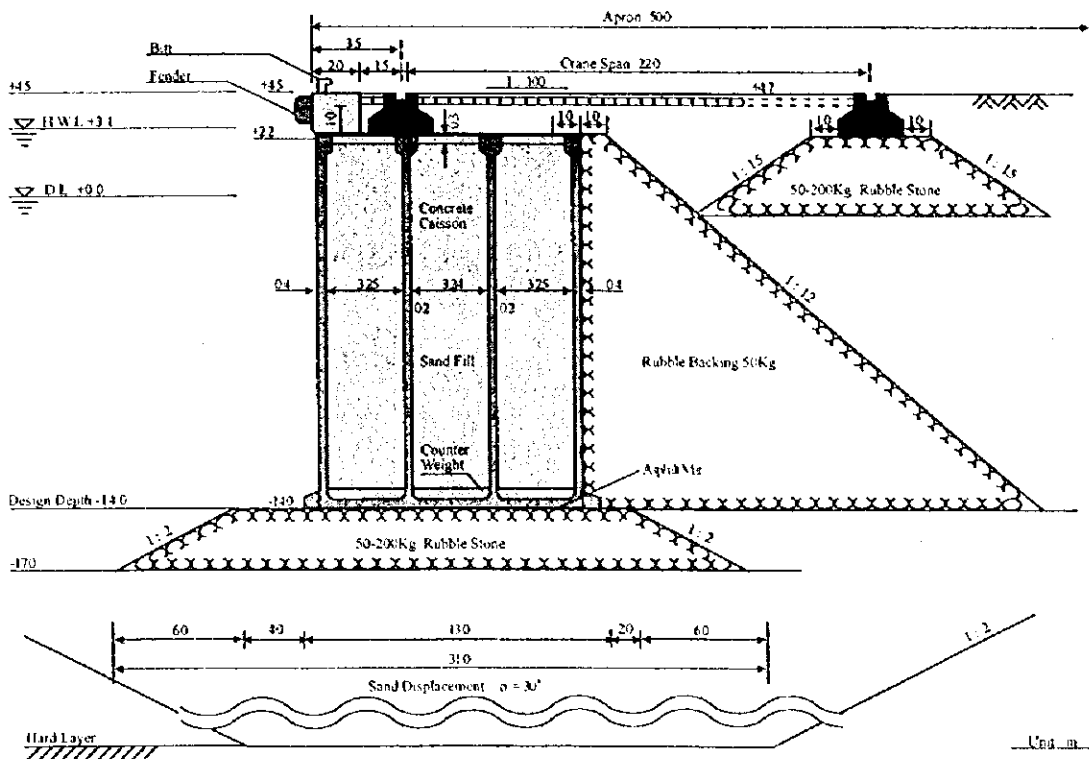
Concrete Caisson Type Container / Bulk Berth (-14m)
